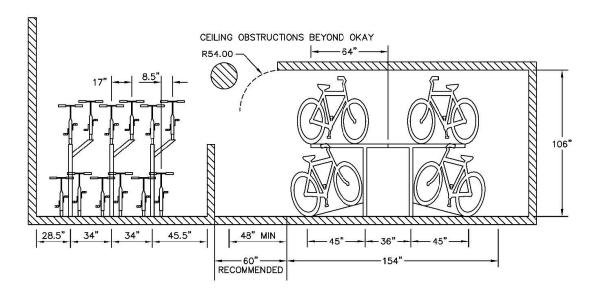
Typical Tow-Tier Lift Assist Rack Layout
